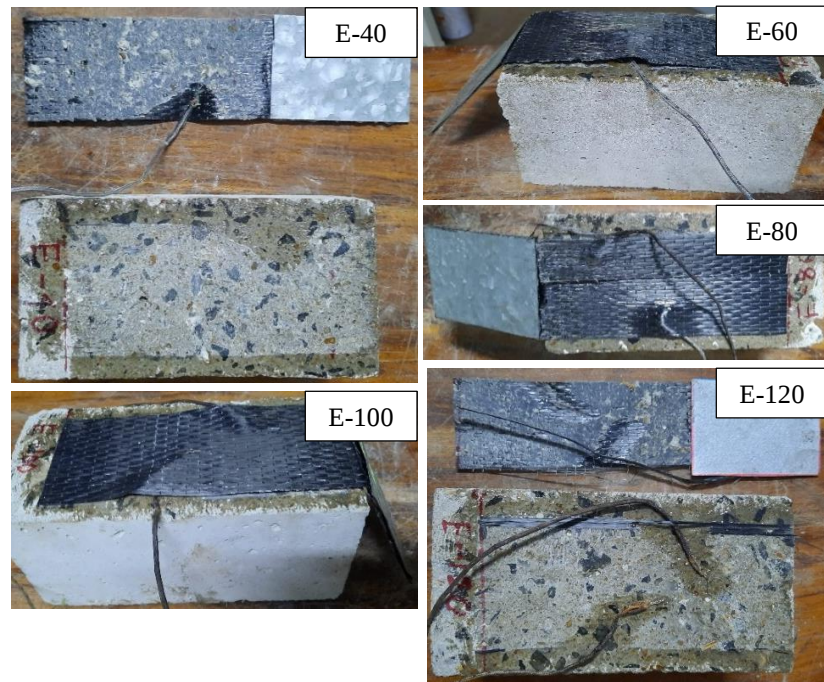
Failure modes of samples with the pure epoxy adhesive
